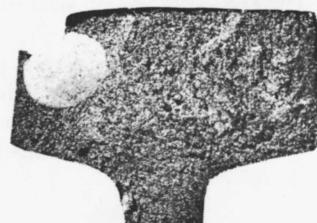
Detail fracture from shelling, with part of shell chipped off.
